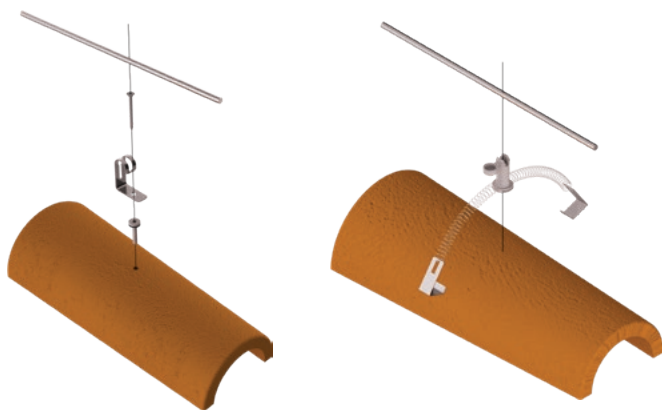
Installation of suitable ridge load-bearing elements on concrete/brick roofing
